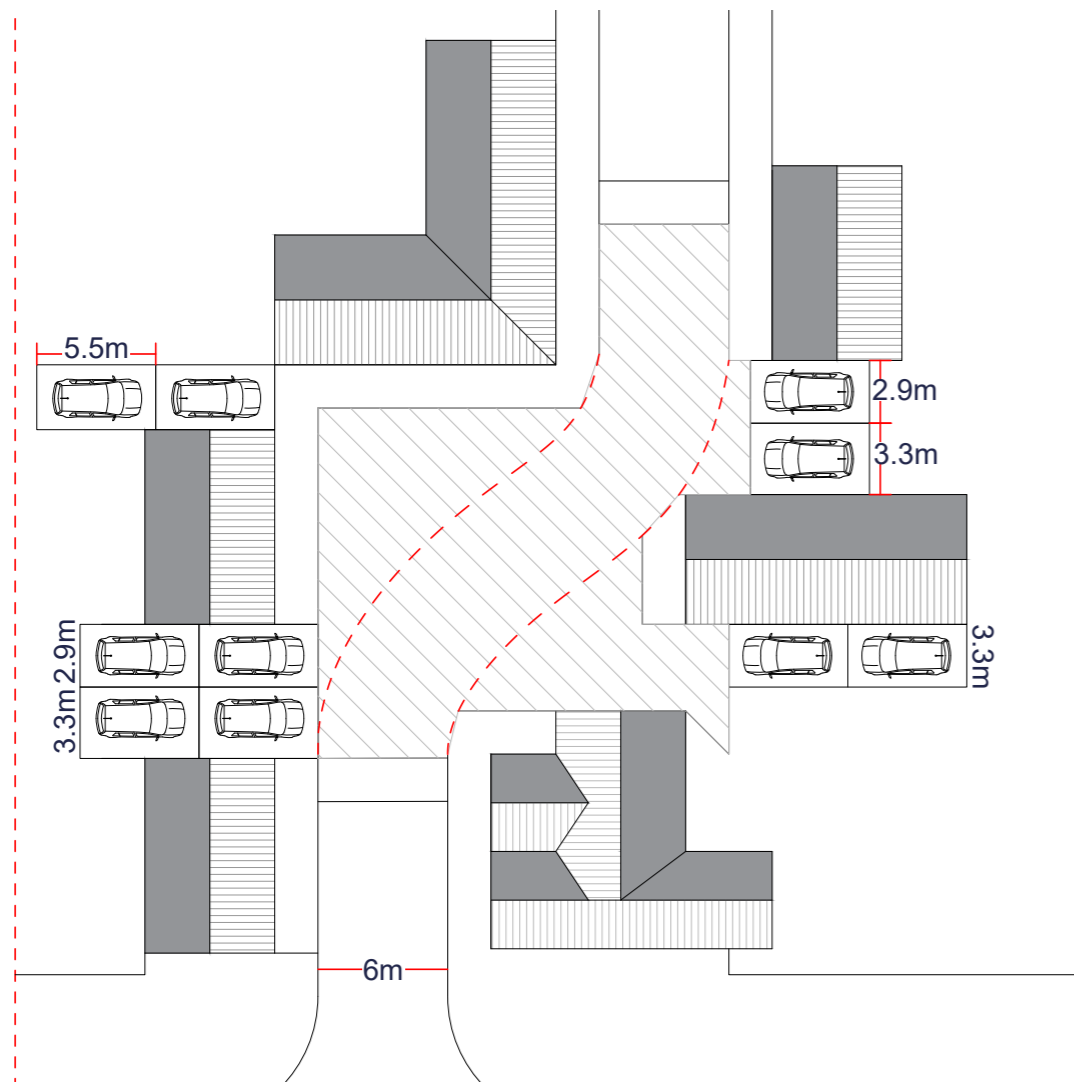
Type G Mews Court Street Plan. (Not to scale)
